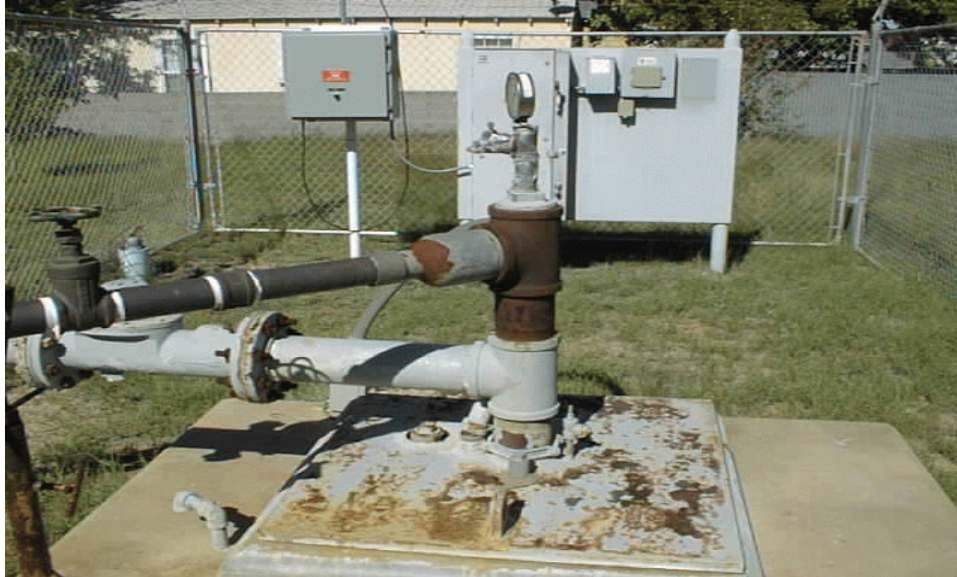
Well G, within Winkler County Park, facing west.
